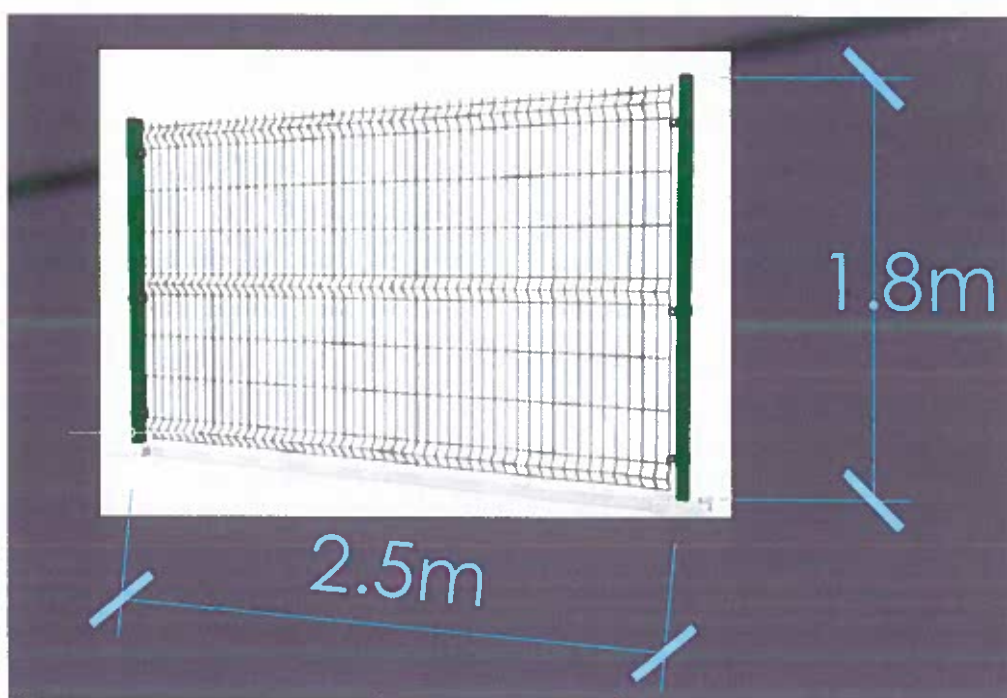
Proposed 1.8 m high green mesh Panel fencing
